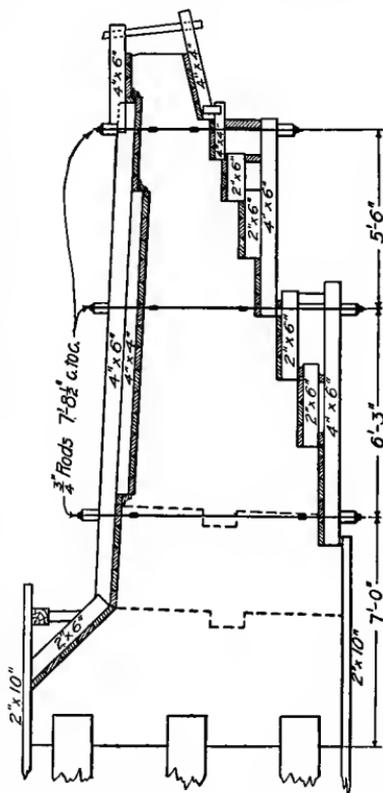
FORMS FOR ILL. CENT. WALL.
